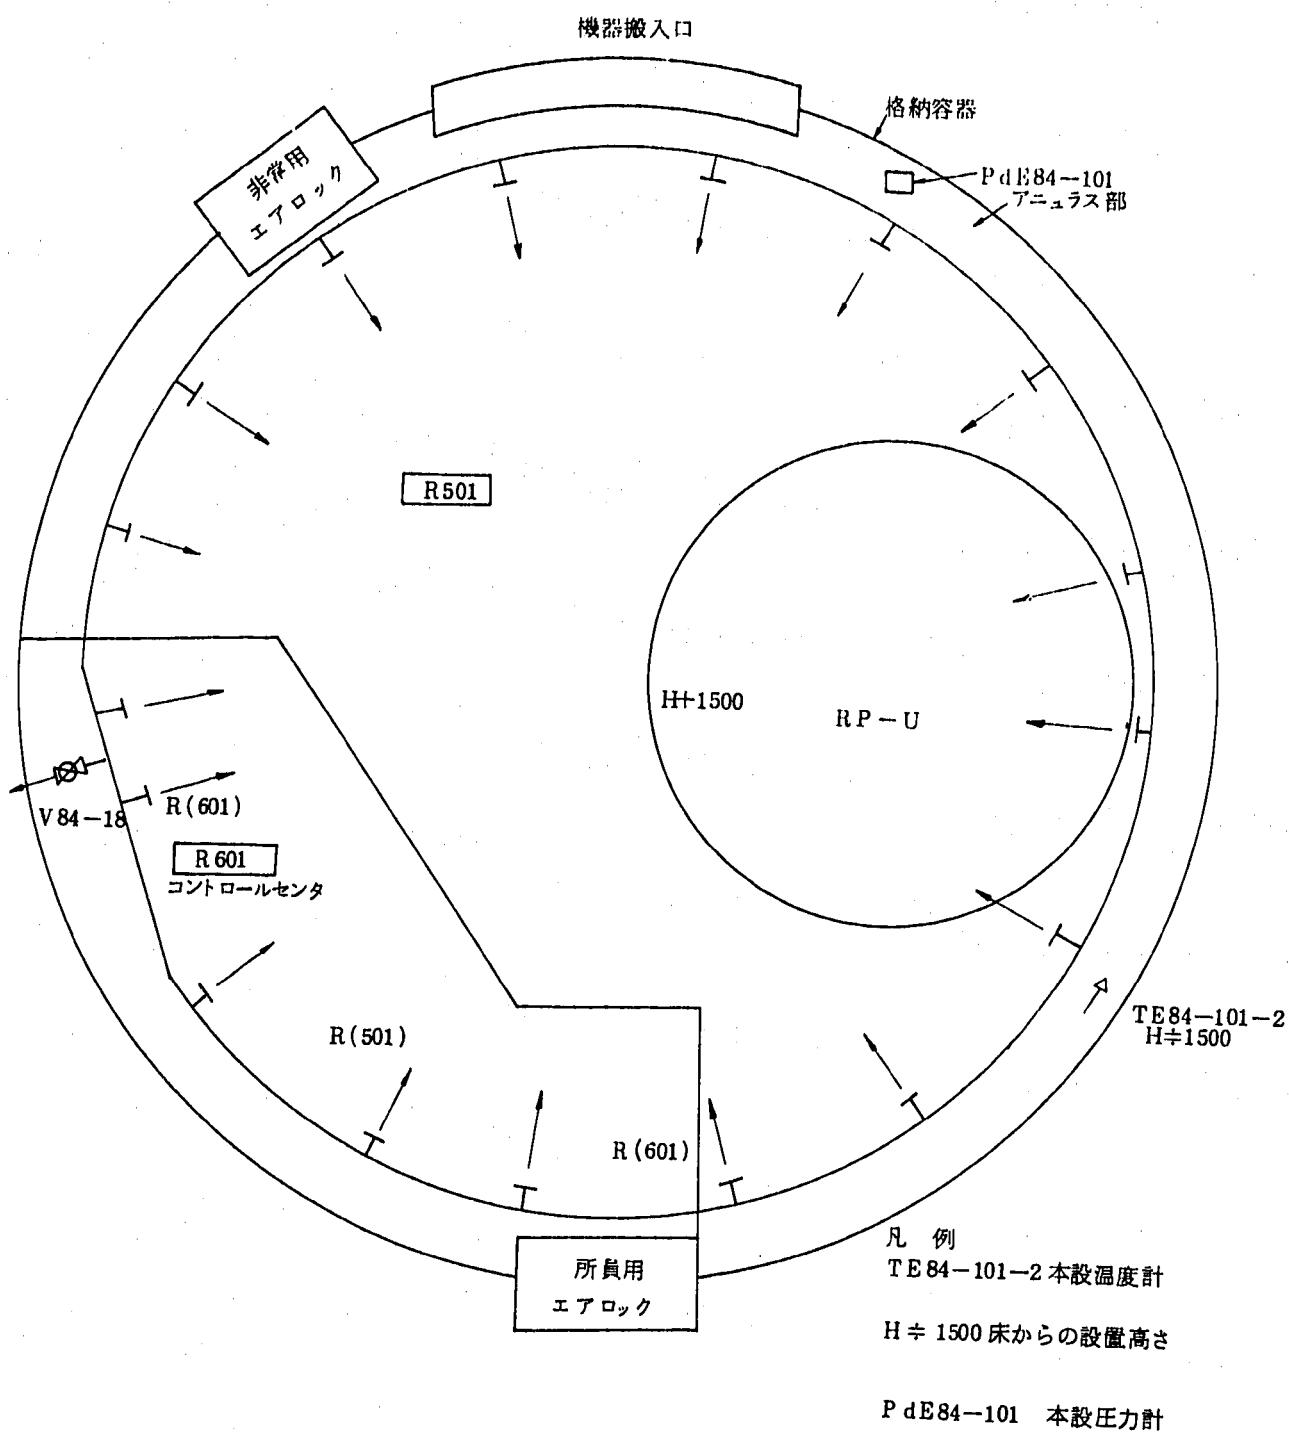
Thermometer and Pressure Gauge Locations in Air Atmosphere (1F) of Reactor Containment Vessel
